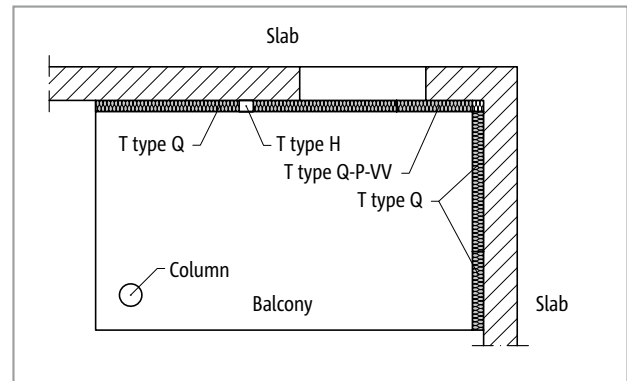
Schöck Isokorb® T type Q, Q-P-VV: Balcony supported on two sides with column and positive shear forces
